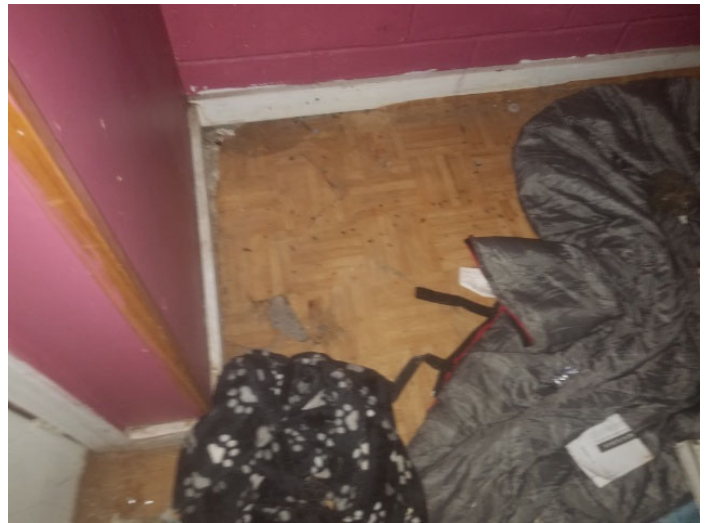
Wood pattern roll vinyl flooring located in unit 1 bedroom.
